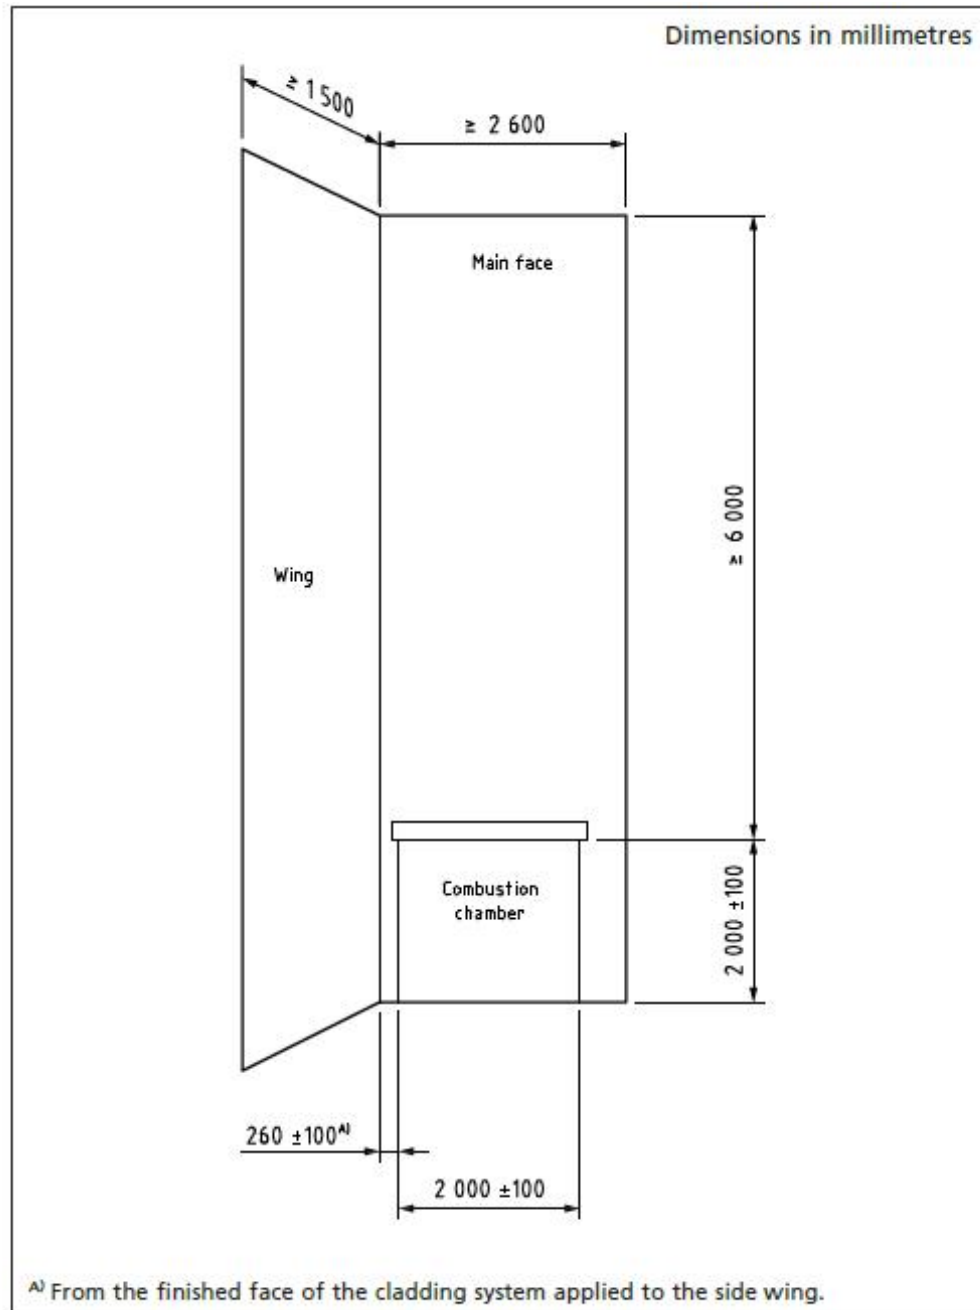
Test apparatus dimensions as specified by test Standard^[1].
